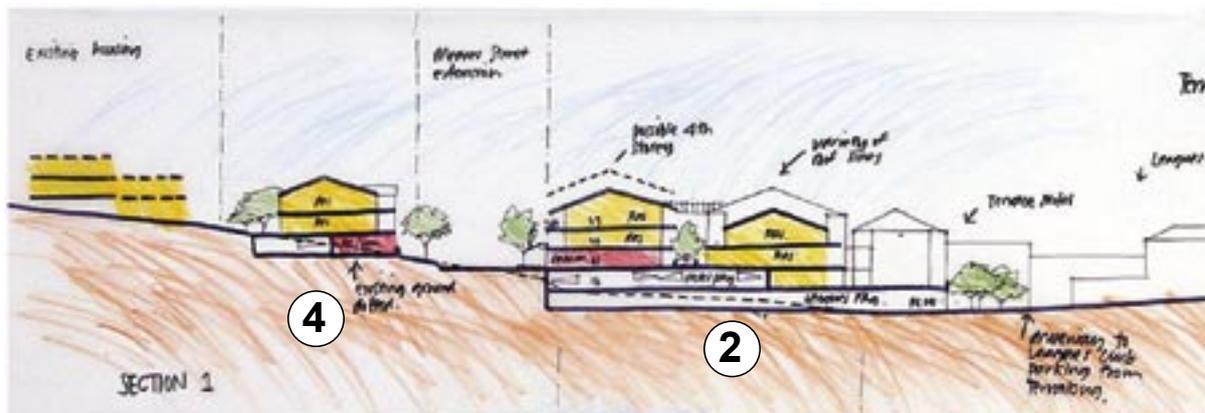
Section through the hillside showing Meares St extension, with new apartments up the hill (4) and parking structure with convention facility on the downhill side (2).
